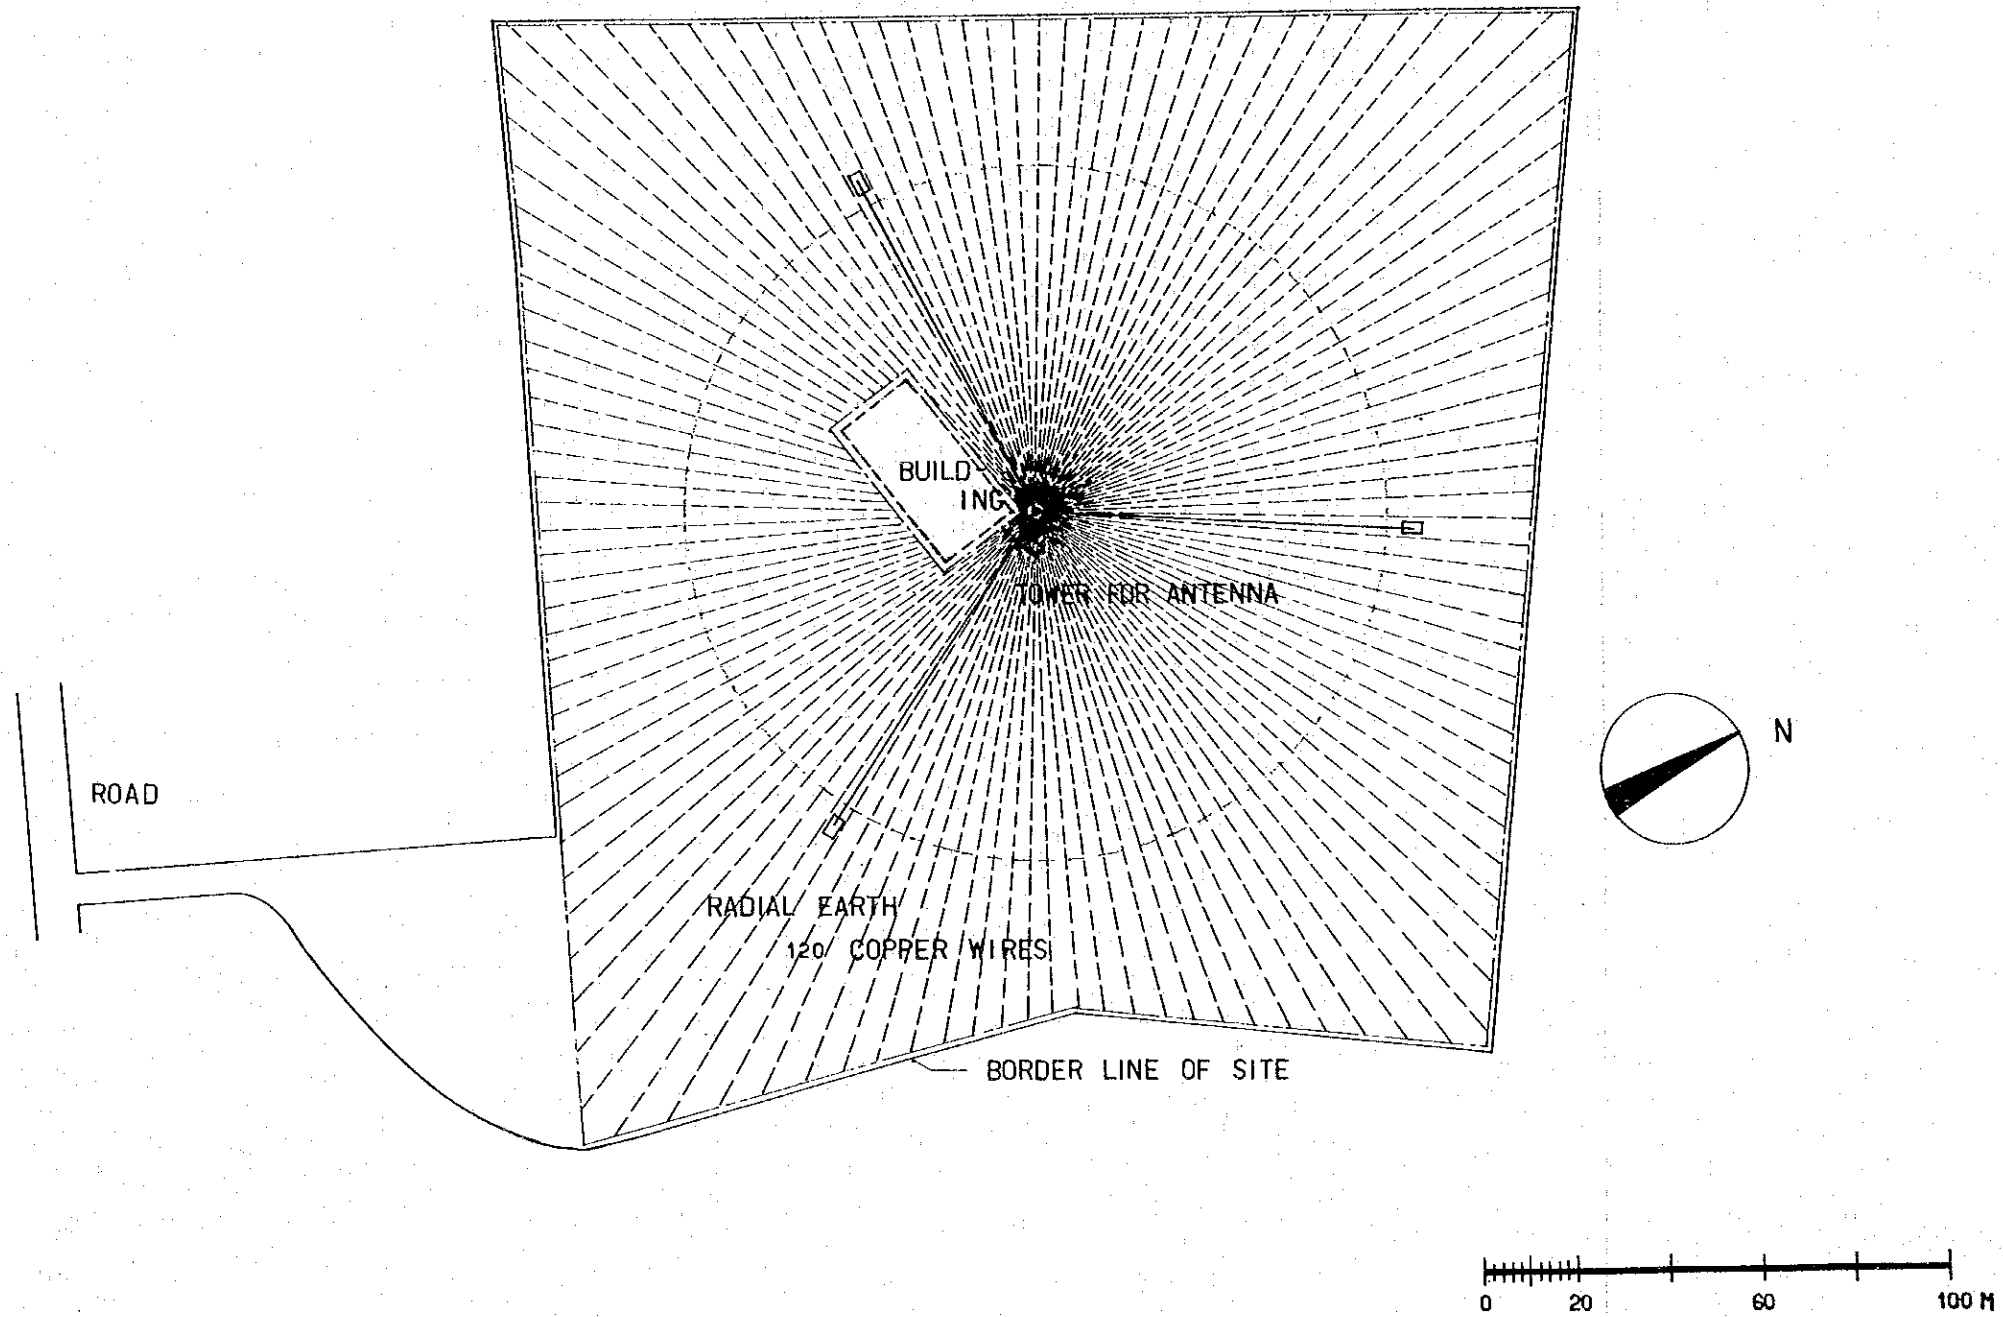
LAY-OUT OF TOWER AND EARTH — POKHARA TRANSMITTING STATION
